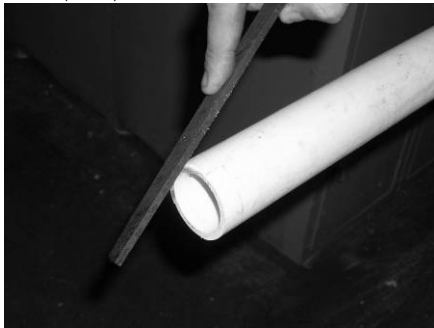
A file being used as a technique for beveling large diameter pipe.
